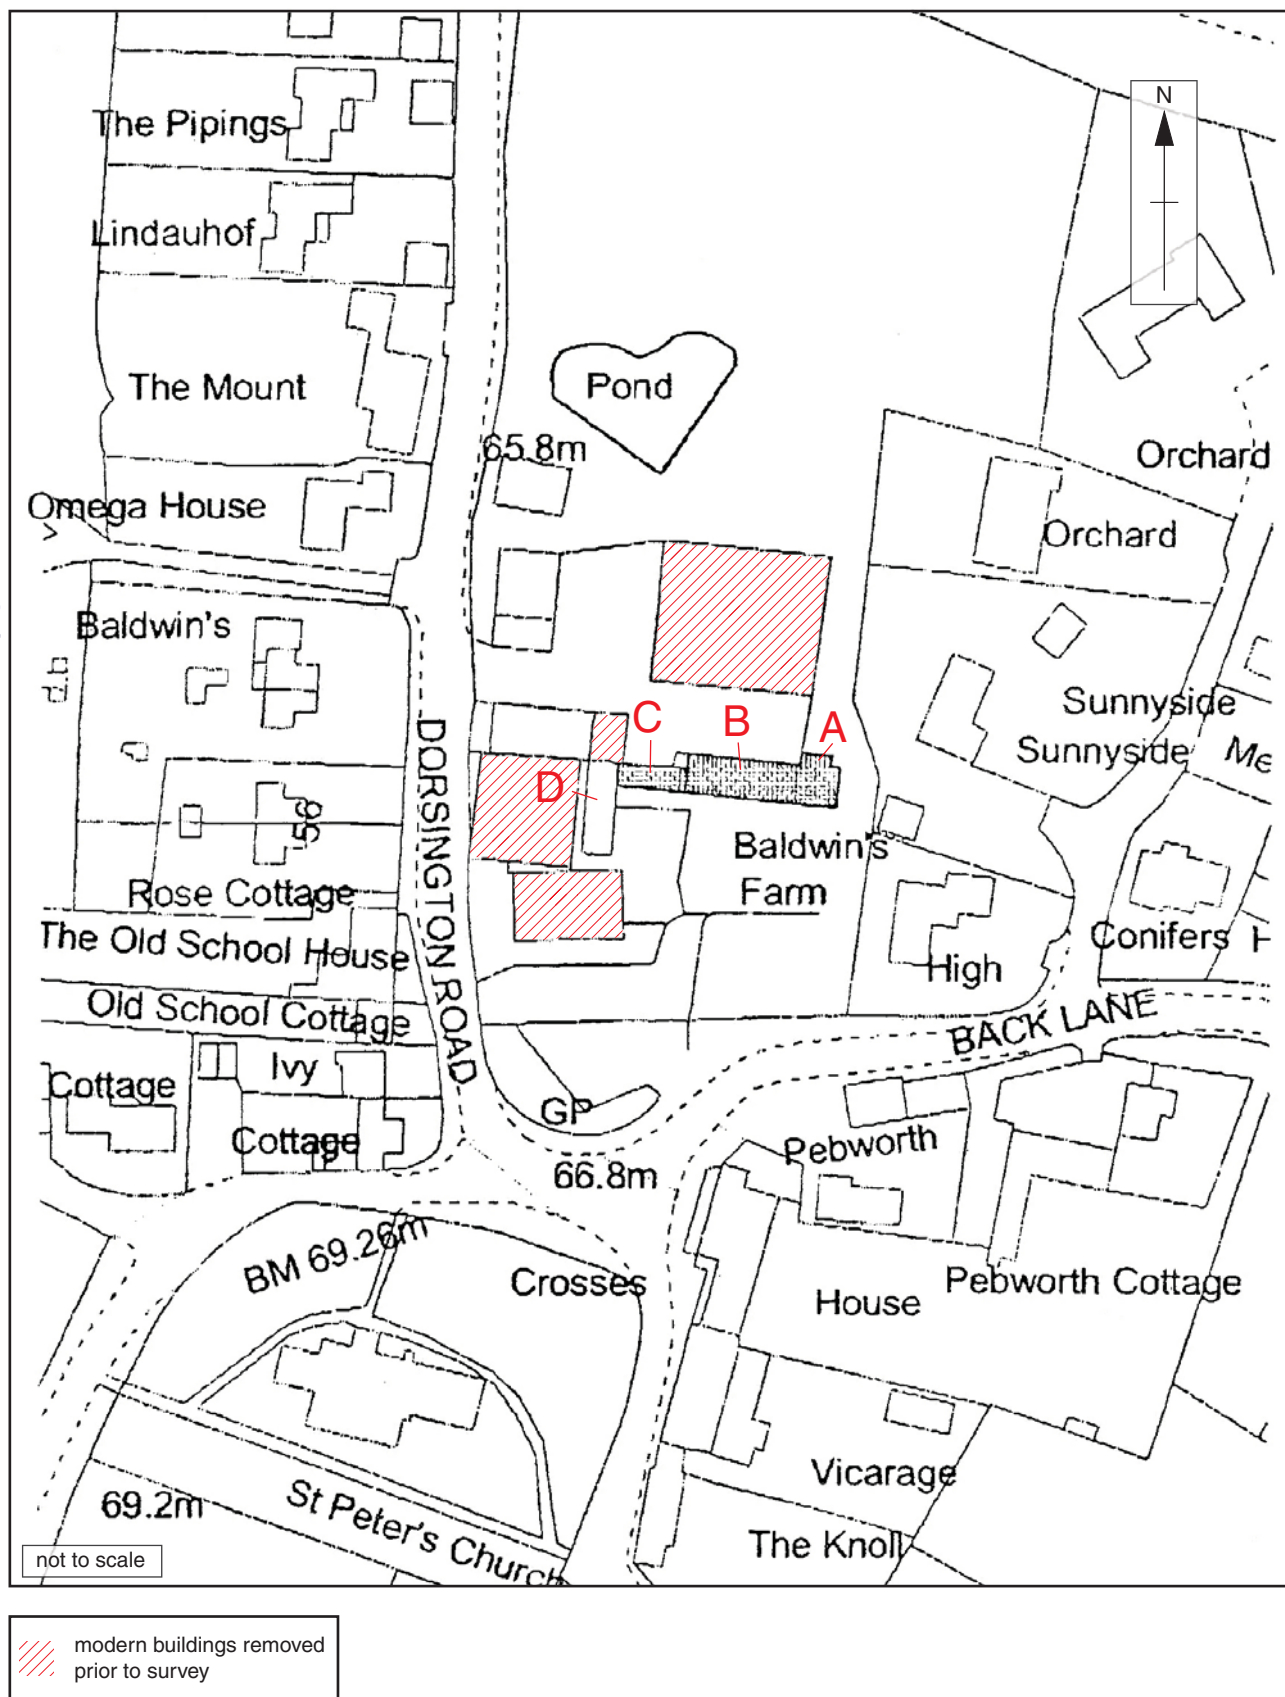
Site plan (based on plan from brief) with OA block numbers added
